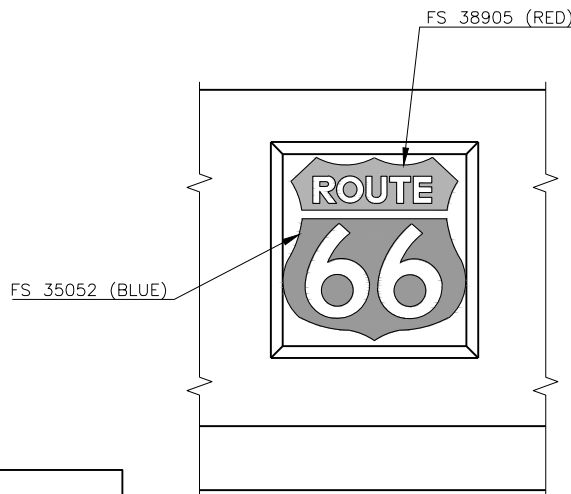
DETAILS OF TRAFFIC RAIL AND PILASTER FORM LINERS
